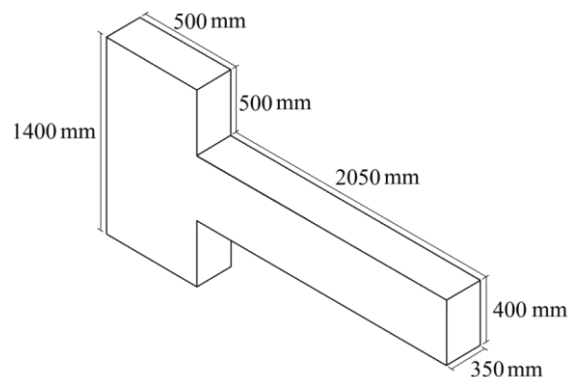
Dimensions of test specimens (dimensions in mm)
